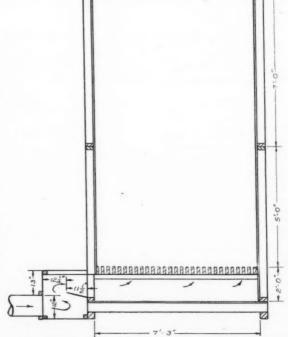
Vertical section (on AA) of test bin and air entrance box
